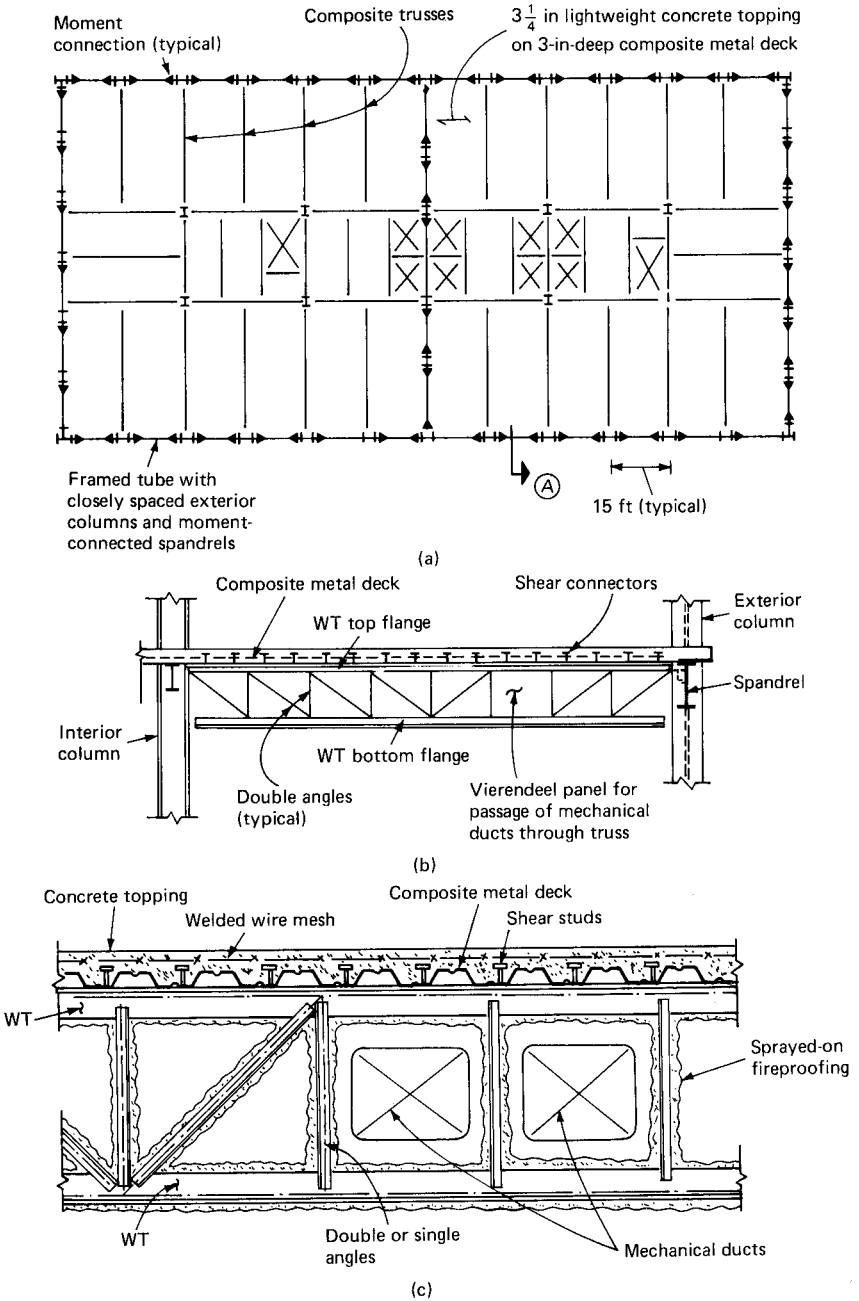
Composite truss. (a) Framing plan; (b) elevation of truss, section A; (c) detail of truss.
